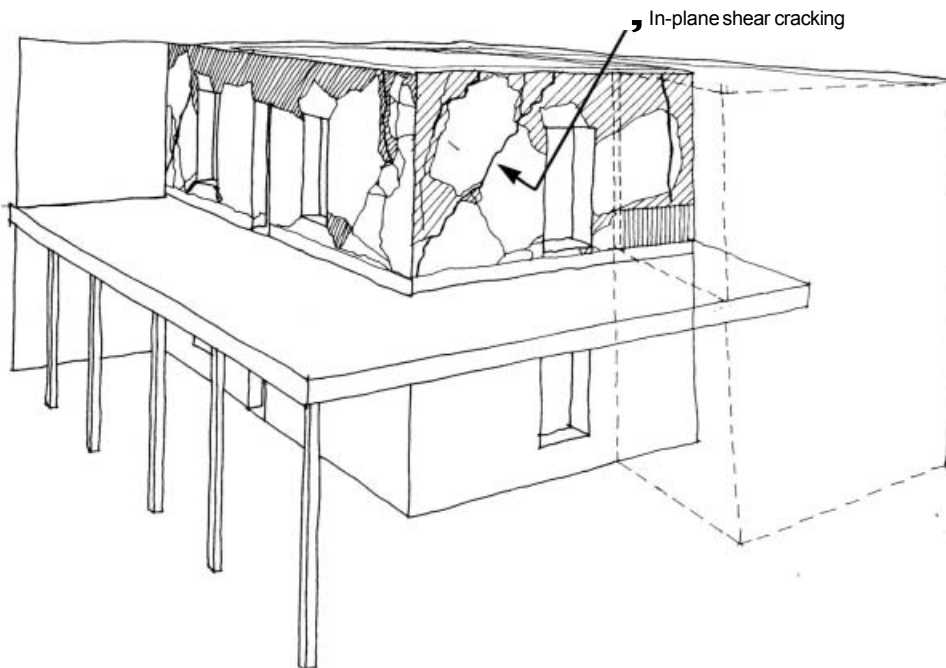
Southeast corner of the Leonis Adobe showing crack and spall damage.
